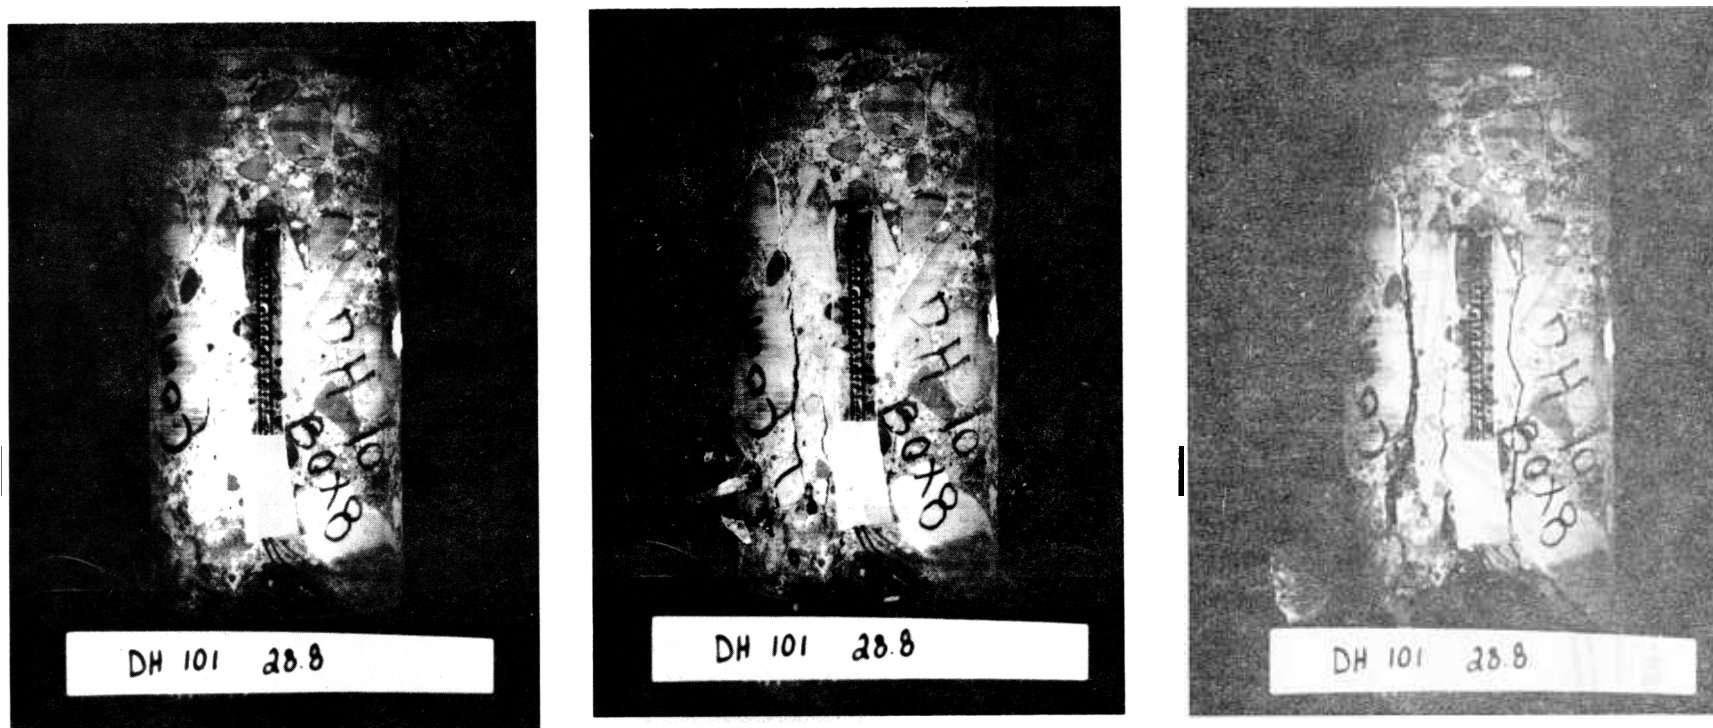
Typical rapid load compression test specimens, Stewart Mountain Dam. P801-D-80459, P801-D-80460, and P801-D-80461
